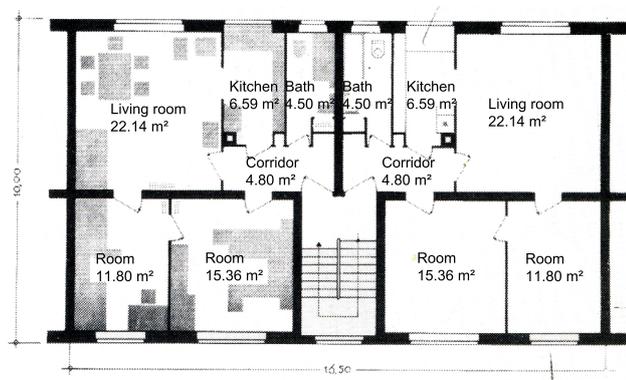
Floor plan of 3 rooms apartment with 65 m² in 1926 (Zick-Zackhausen)
